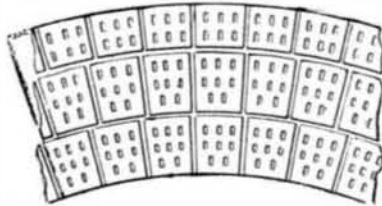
HORIZONTAL SECTION THROUGH A B.
